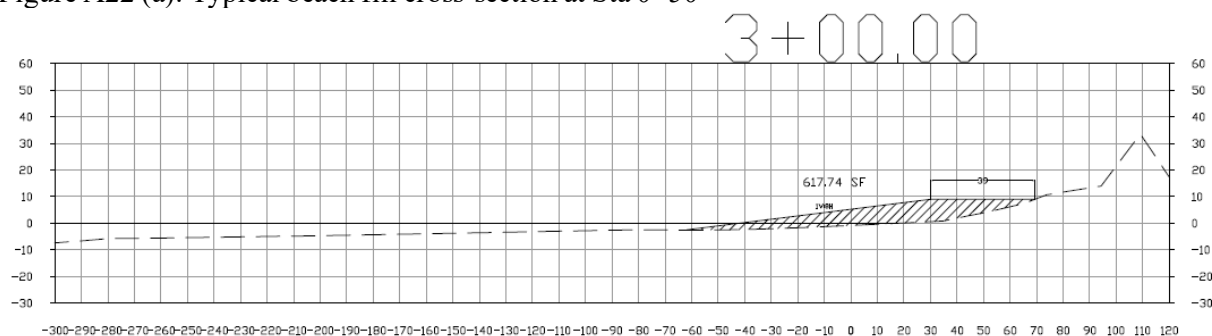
(b). Typical beach fill cross-section at Sta 3+00
